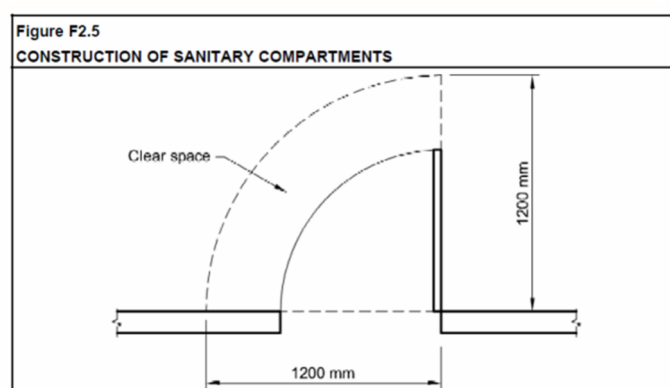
Distance between the door openings and the closet Plans (Source: NCC/BCA)
